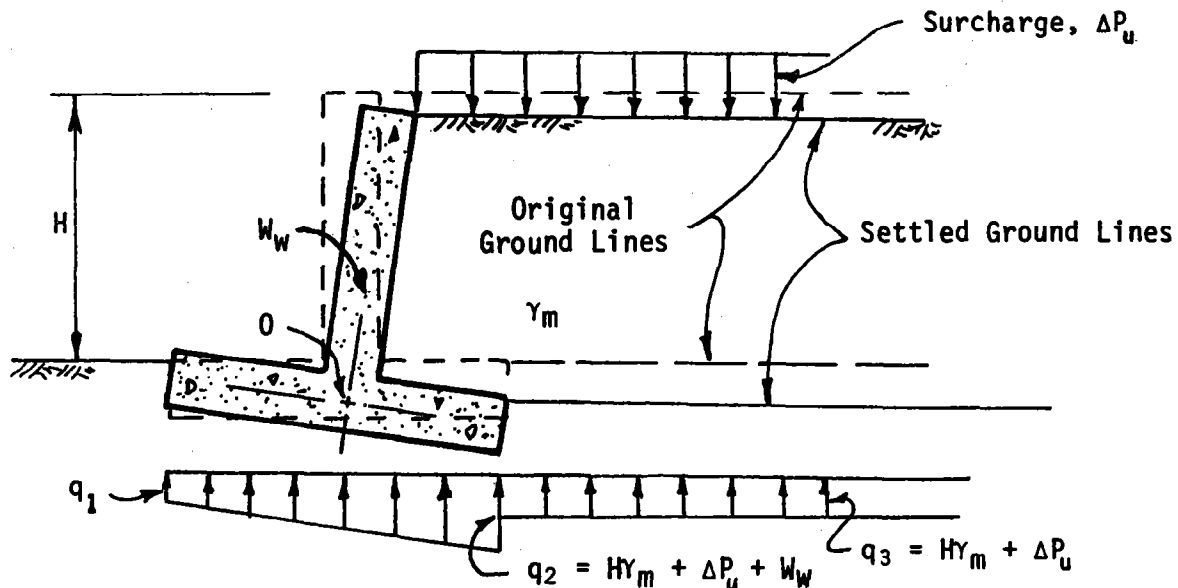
DIFFERENTIAL FOUNDATION SETTLEMENT BENEATH FOOTING AND FILL
